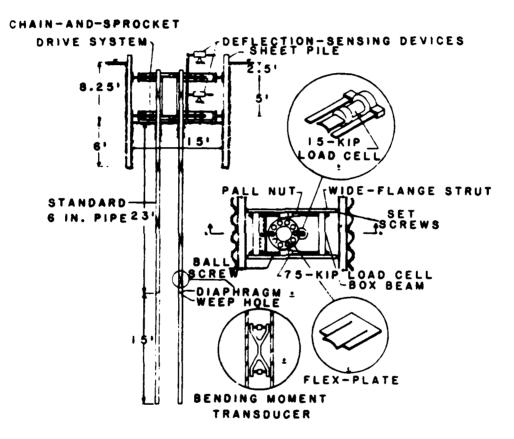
Arrangement of Equipment for Field Tests - Harvey, La.
